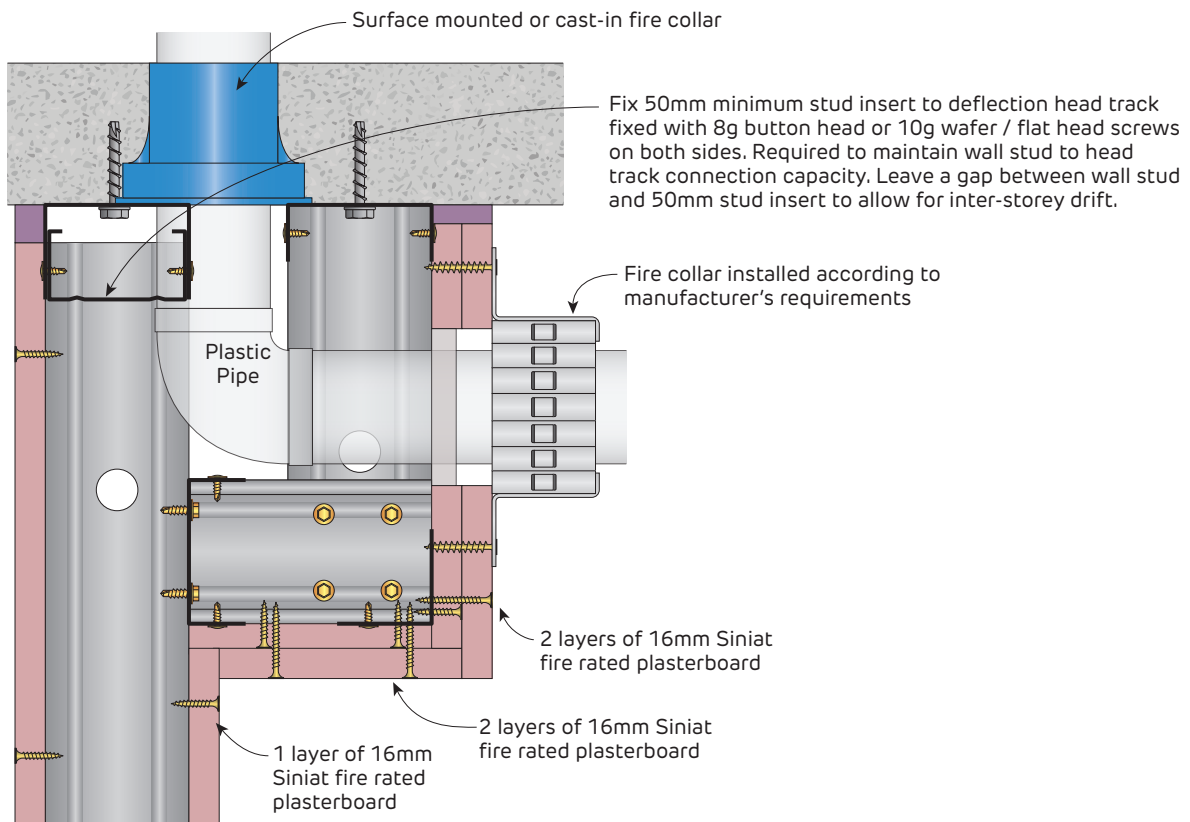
Fire Rated Bulkhead under Plastic Pipe Slab Penetration
